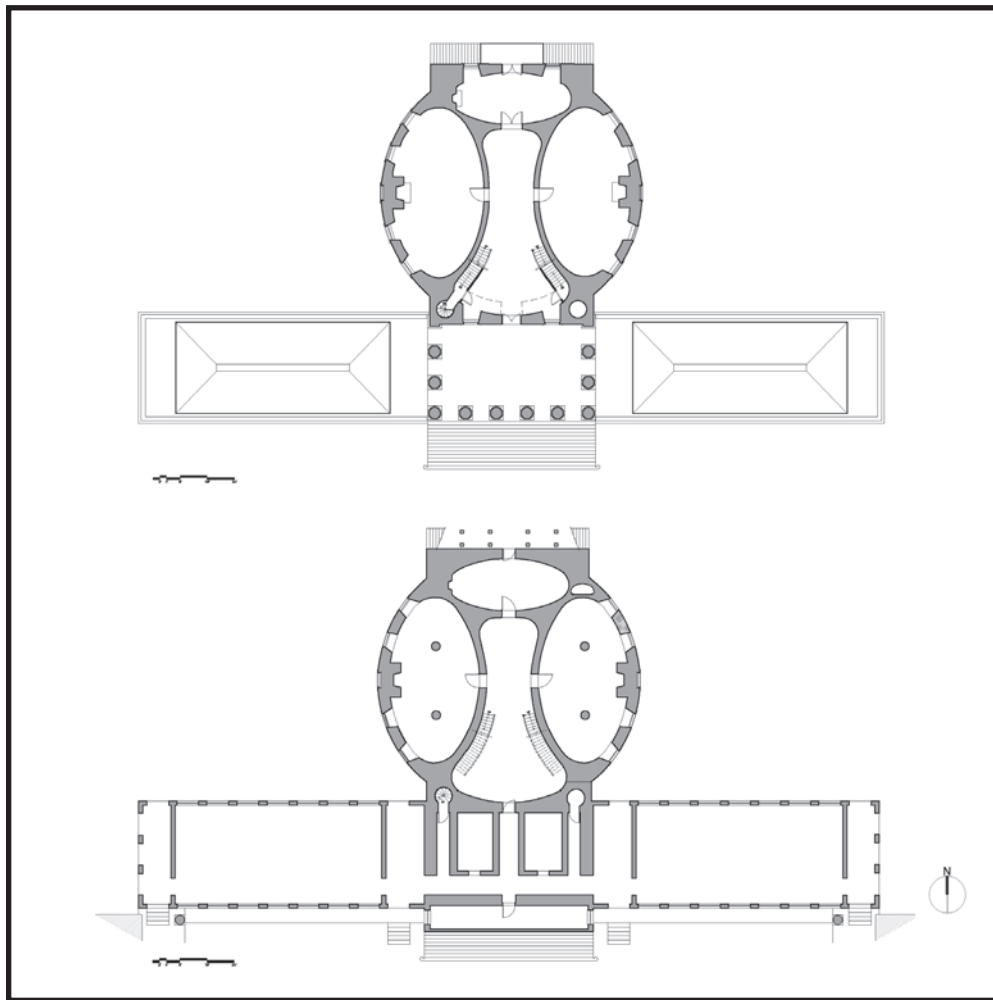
Conjectural floor plans of the Rotunda and terraces in 1841; main floor (top) and ground floor (bottom). Drawings by John G. Waite Associates, Architects, 2022.
